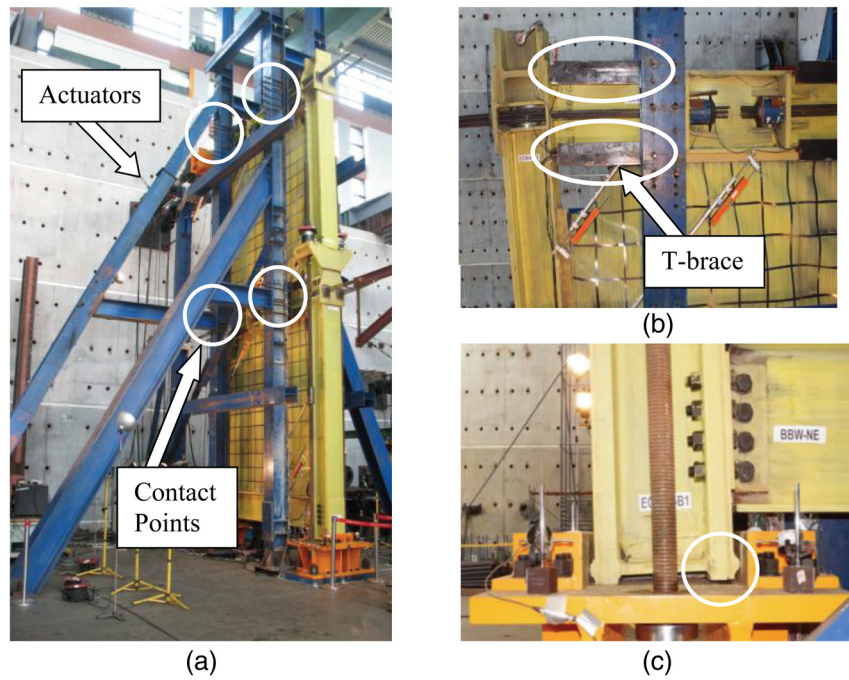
(a) Specimen NZ; east column positive drift; (b) joint; (c) column base rocking
